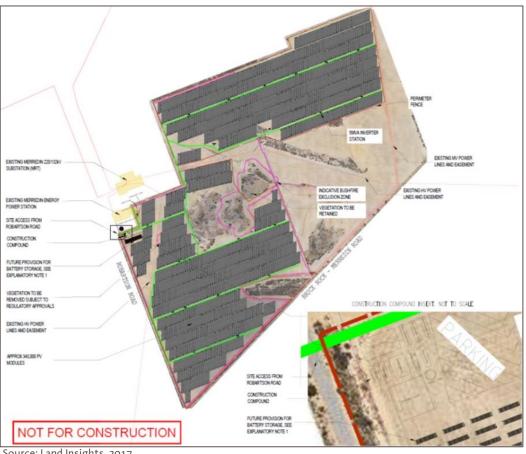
ORIGINAL SITE LAYOUT AS APPROVED
